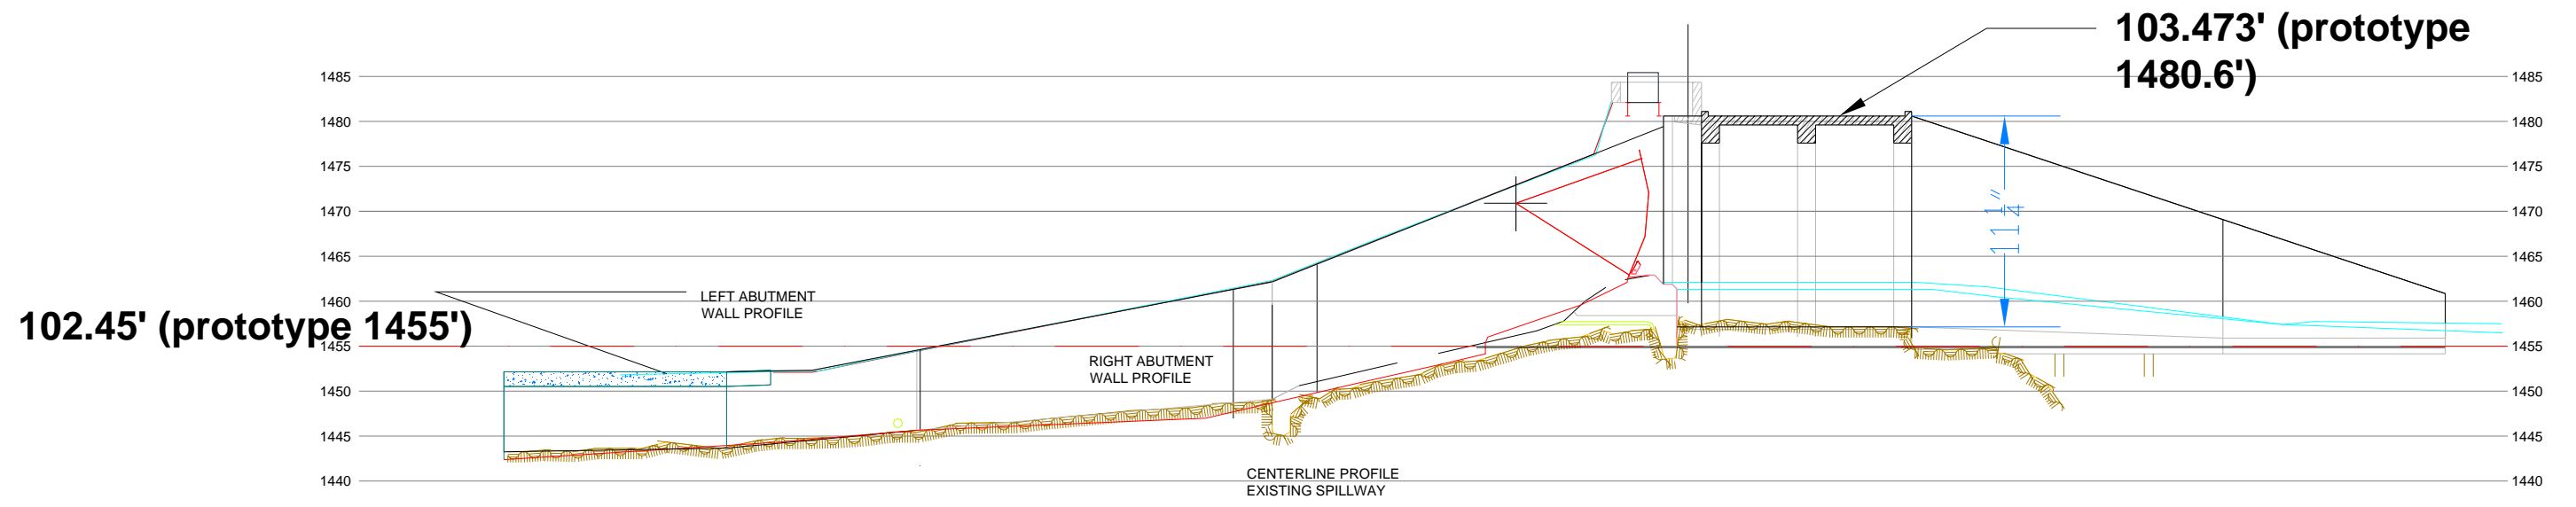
Flood of April 2002 (1,948 cfs) modeled in a 1:25 scale model at SAFL with water
